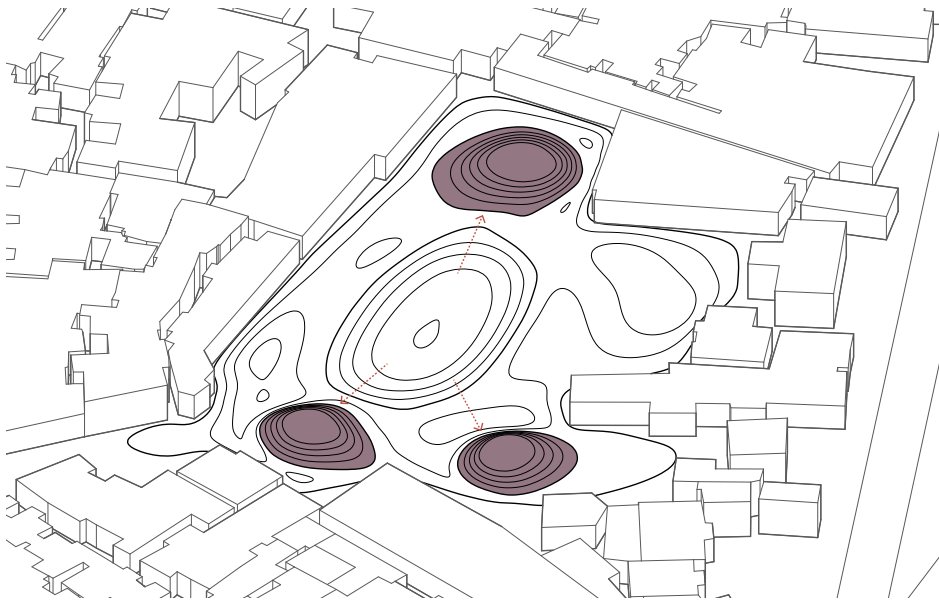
Excavated soil will be used to build up earth mounds that have a total volume of 2252 m³.
